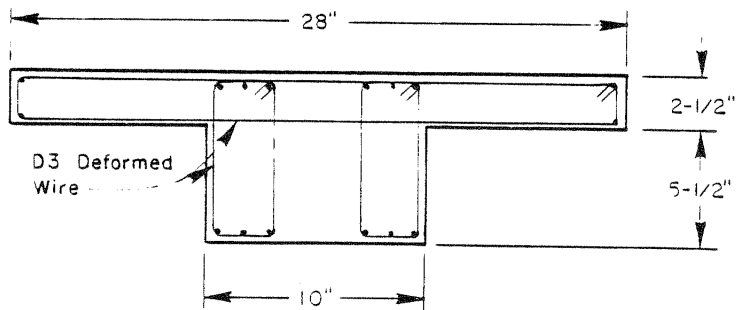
Wall pier reinforcement detail (Shiu et al., 1981)
